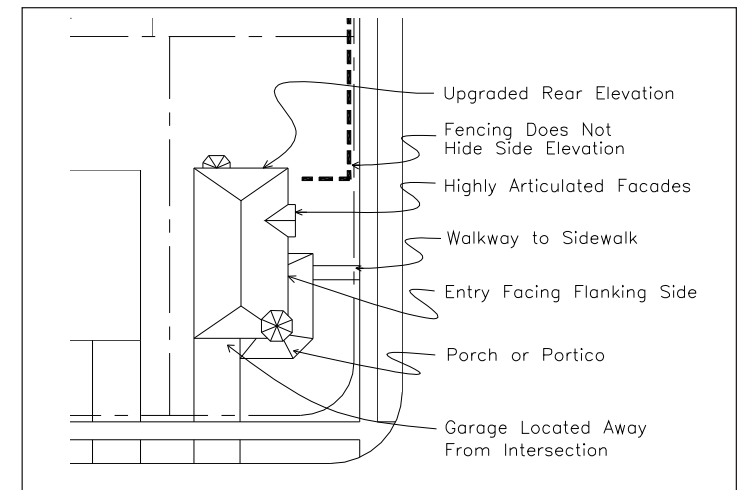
Conceptual plan view of corner dwelling
